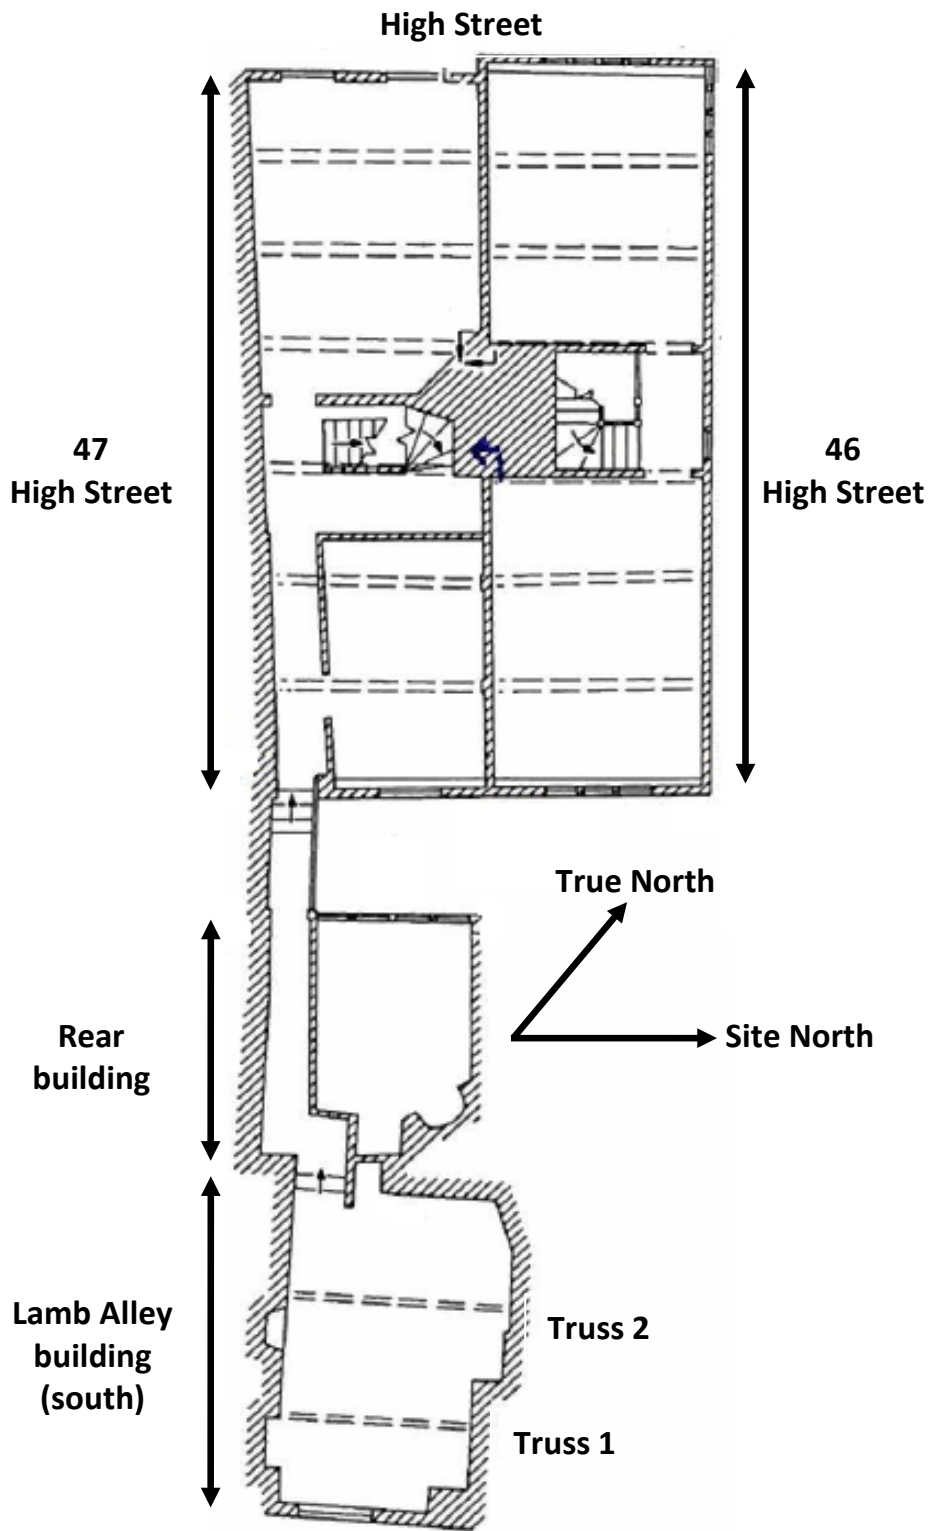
Outline plan of 46/47 High Street and the buildings to the rear (after Richard Parker)
